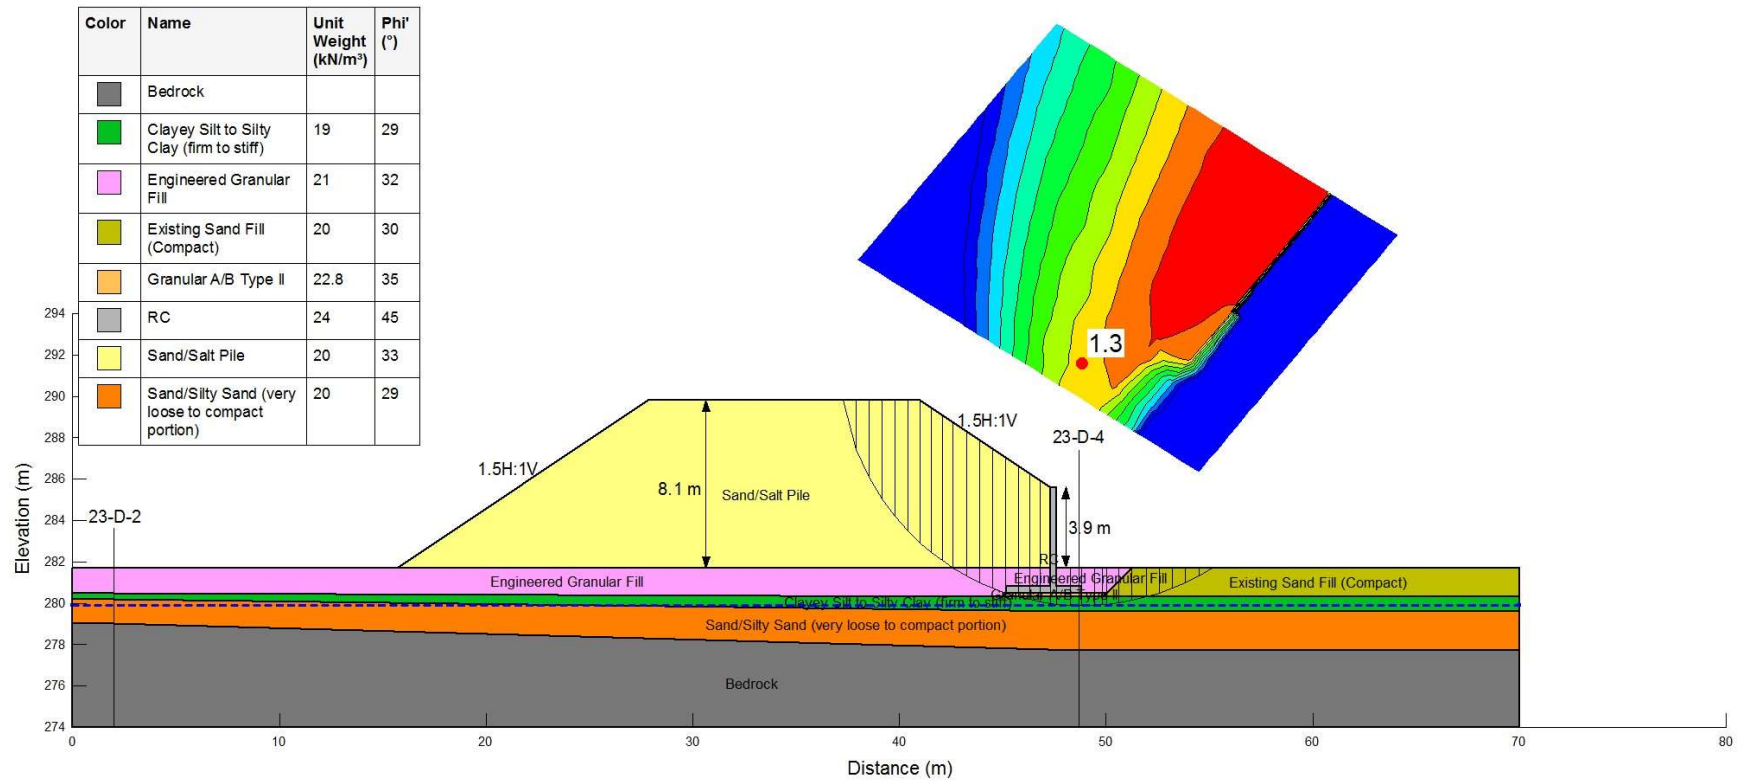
Slope stability analysis of new material storage building – N-S section, north side wall – drained seismic analysis
